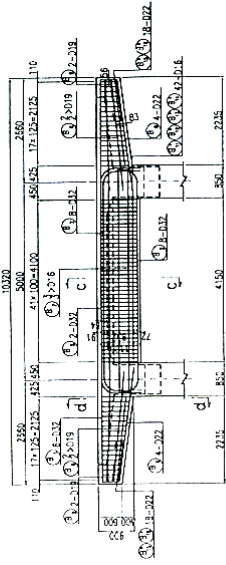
Schematic drawing of the prototype rigid-framed railway bridge.
